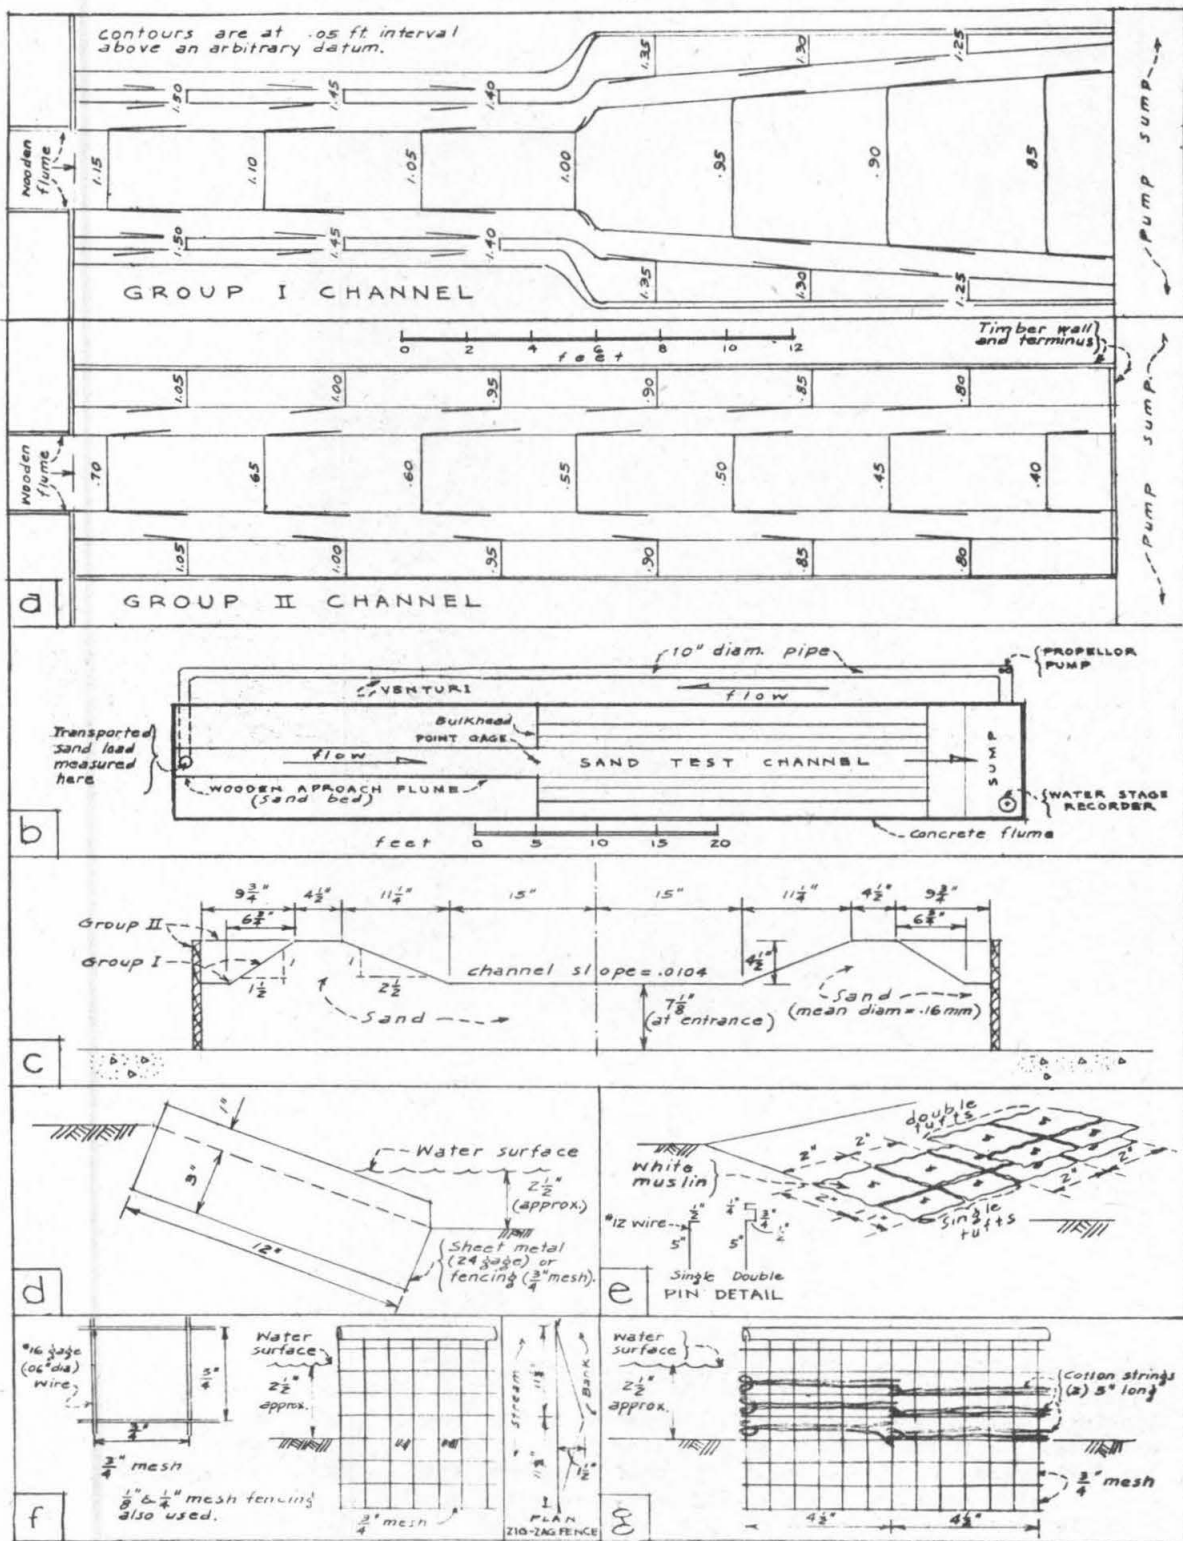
DETAILS OF LABORATORY TEST CHANNELS AND REVETMENTS USED THEREIN
